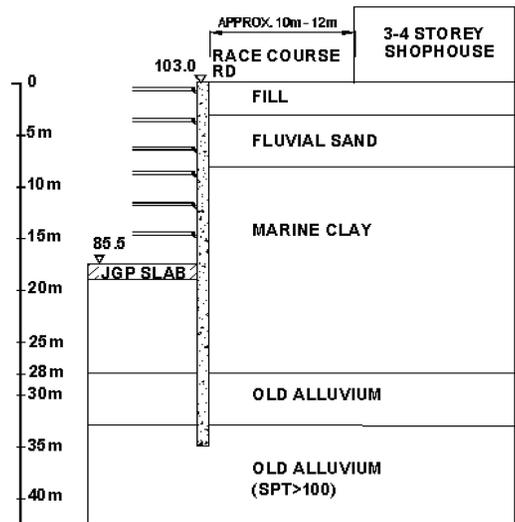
Jet grout slab used as a buried strut, cut-and-cover tunnels along Race Course Road.
